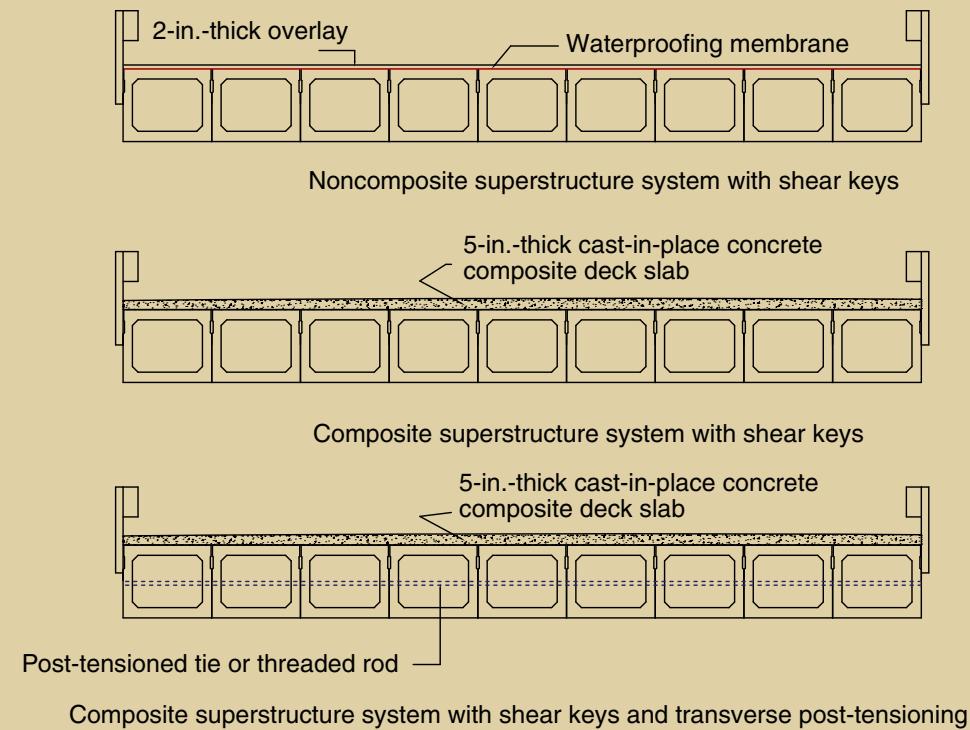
Adjacent-box-girder bridges incorporate various practices in the design and detailing of transverse connecting systems. Note: 1 in. = 25.4 mm.
